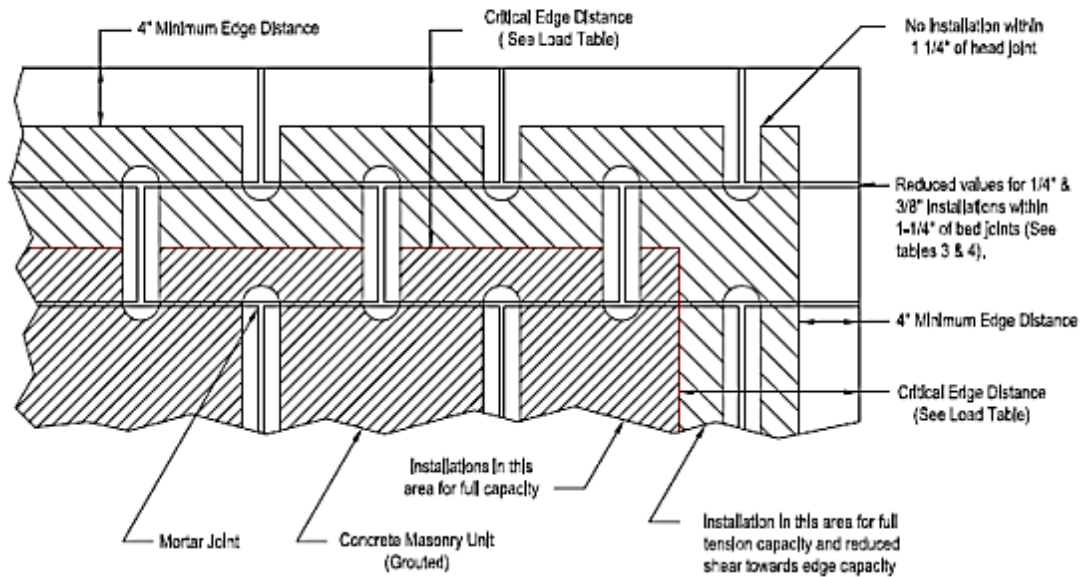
ACCEPTABLE LOCATIONS (SHADED AREAS) FOR HILTI KWIK HUS-EZ ANCHORS IN GROUT-FILLED CONCRETE MASONRY
